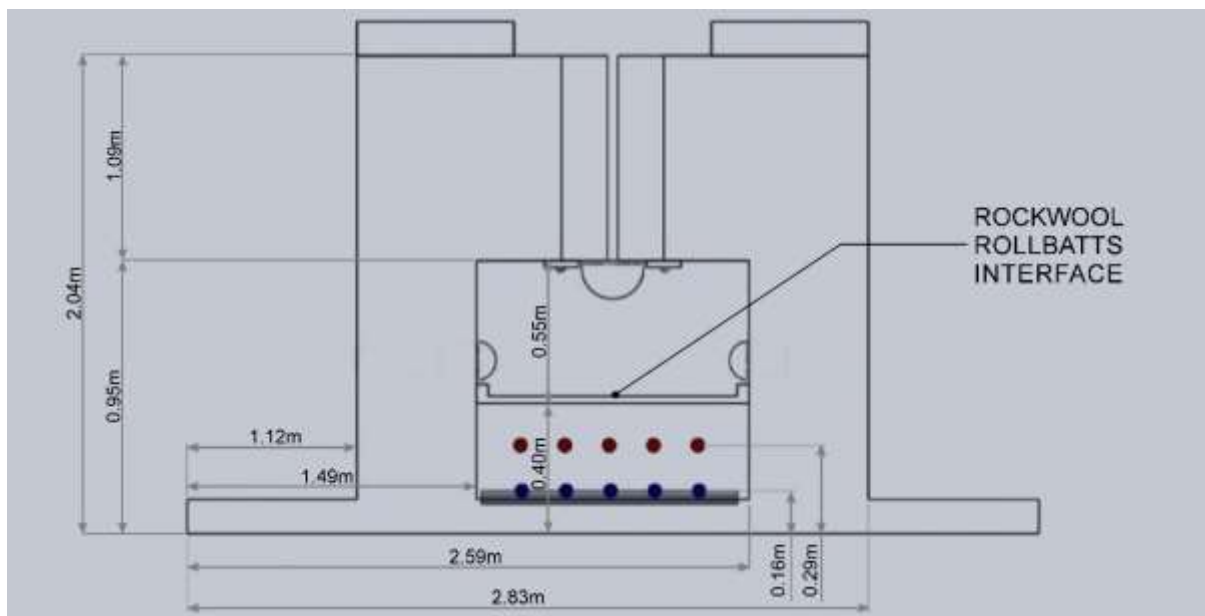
2D cross-section at joint “C” – actual construction details.
